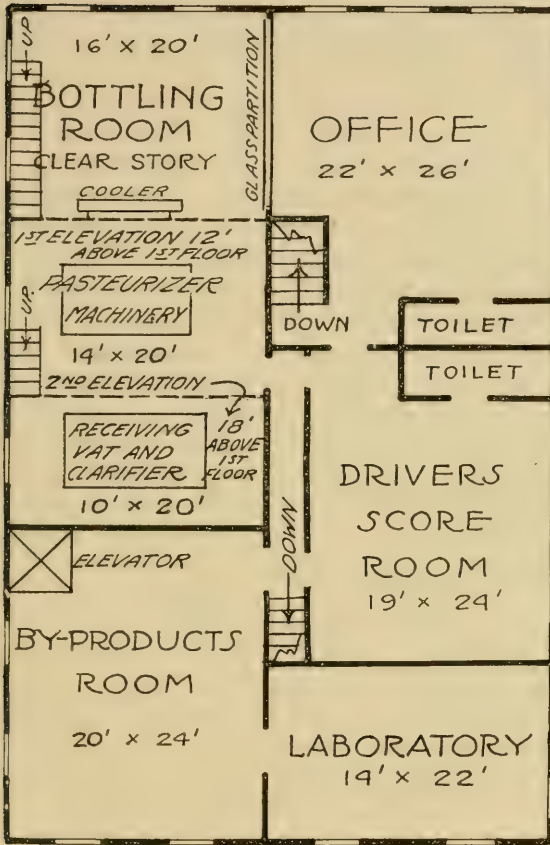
A.—Second-floor plan for a two-story plant of from 2,000 to 3,000 gallons' daily capacity.
